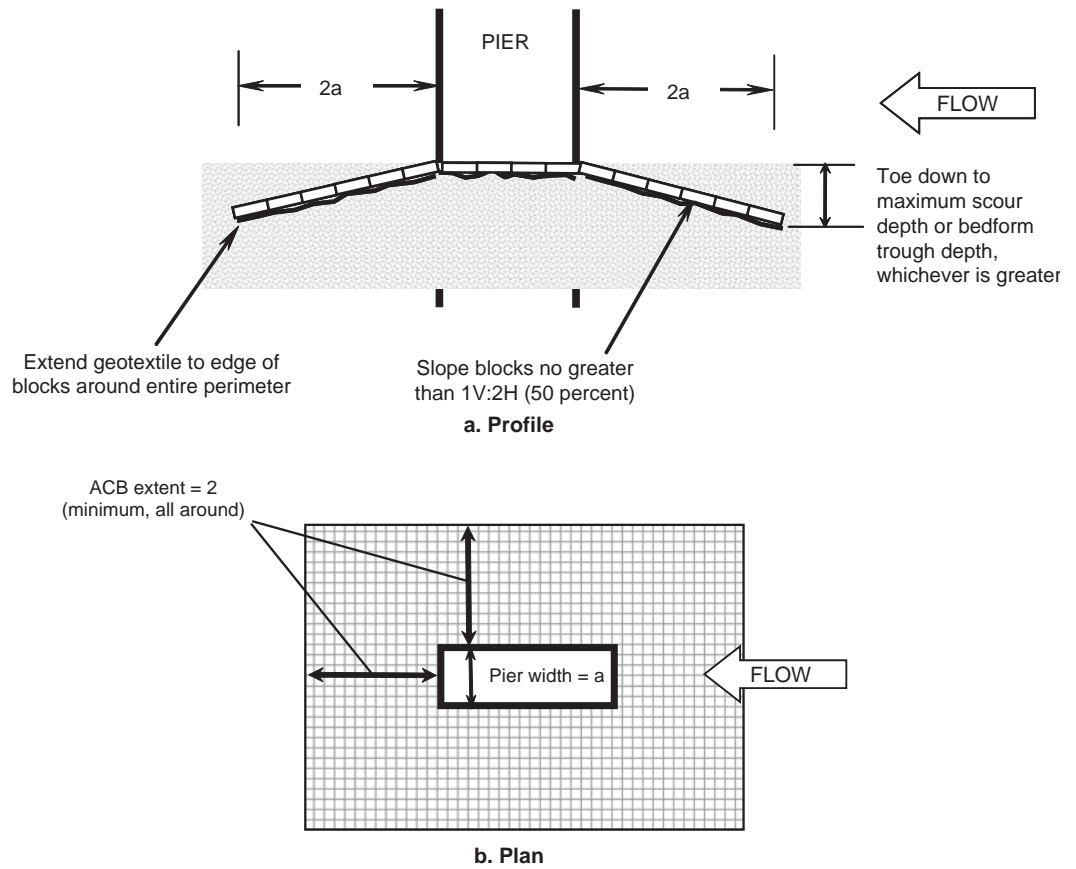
ACB layout diagram for pier scour countermeasures.
